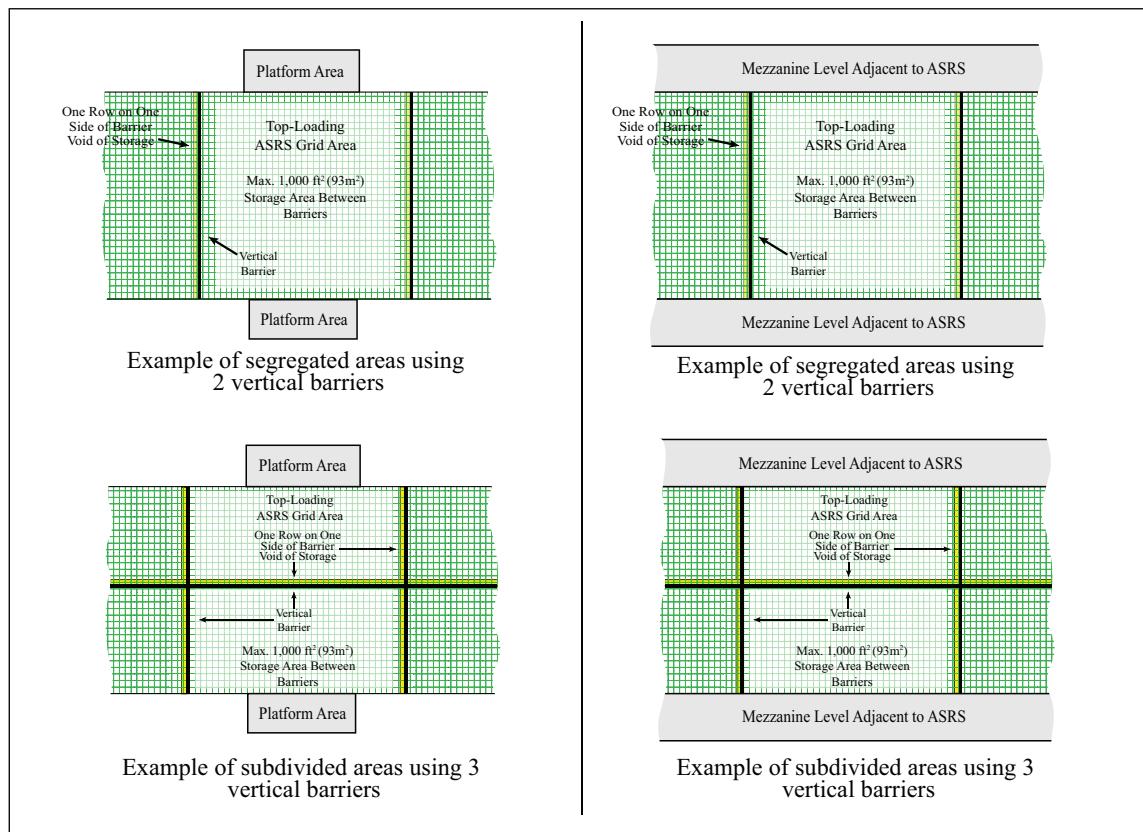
Examples showing the use of vertical barriers within a TL-ASRS arrangement
